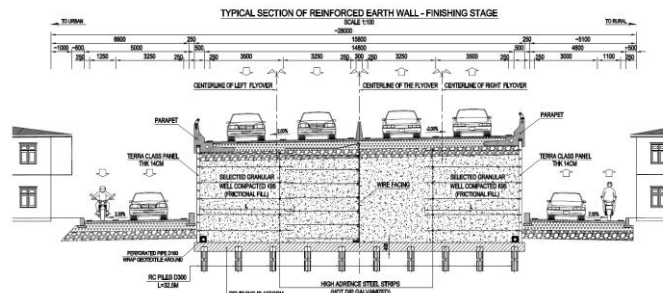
Section of stage 2 of a two-stage construction of Reinforced Earth
